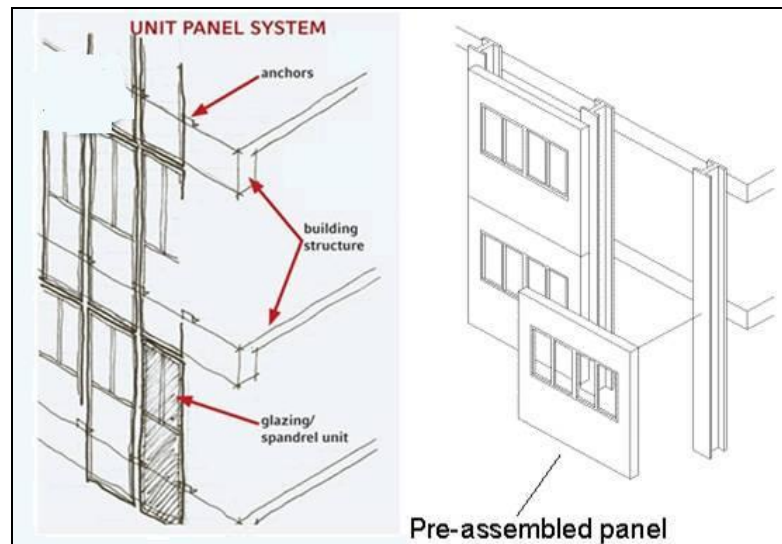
Detail of Panelized Curtain Wall System (Helmut, K. 2008) and <http://www.cwct.co.uk/facets/pack03/0106.htm>
